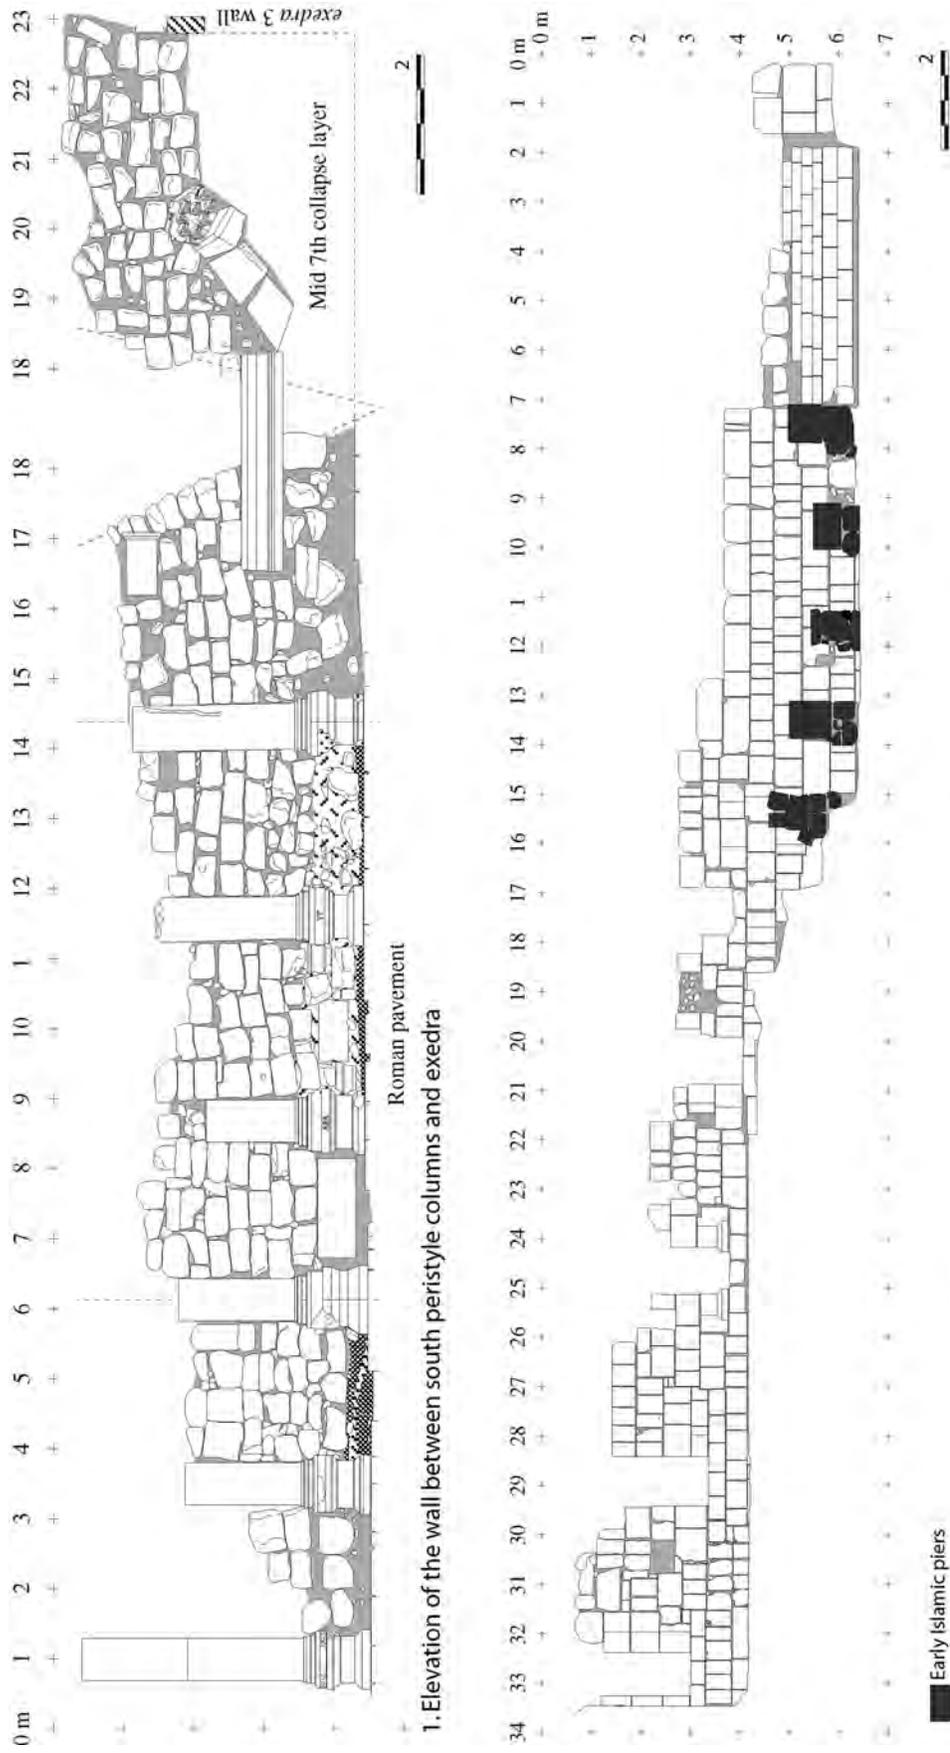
1. Islamic wall between south peristyle columns and exedra 3. 2. South façade.
